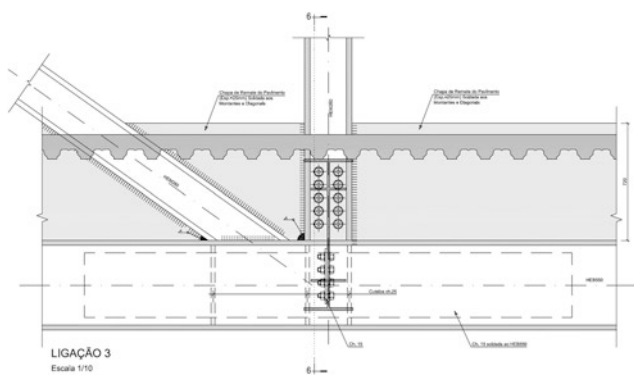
Detail of the connection between the slab and the steel structure, long section
